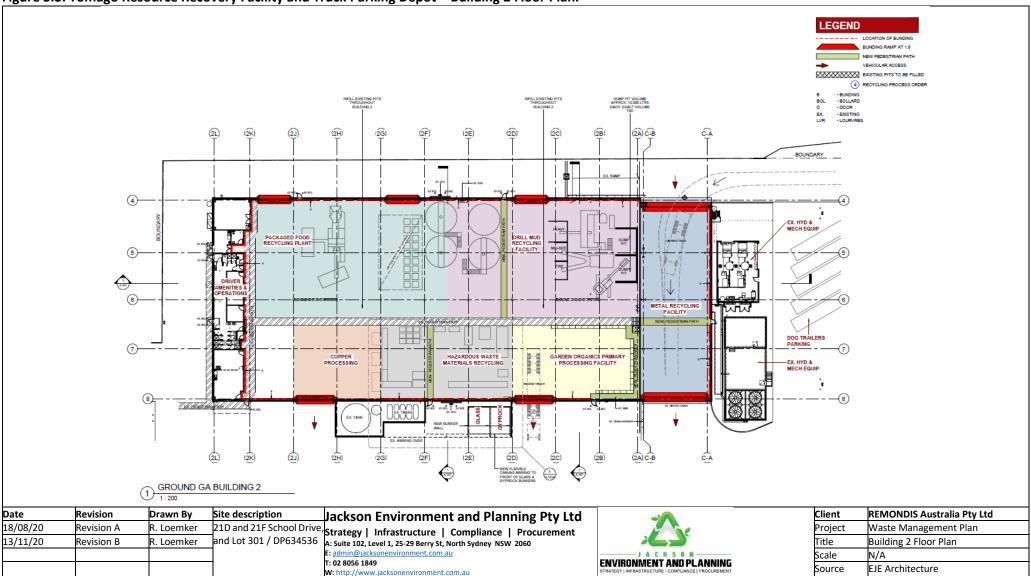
Tomago Resource Recovery Facility and Truck Parking Depot – Building 2 Floor Plan.
